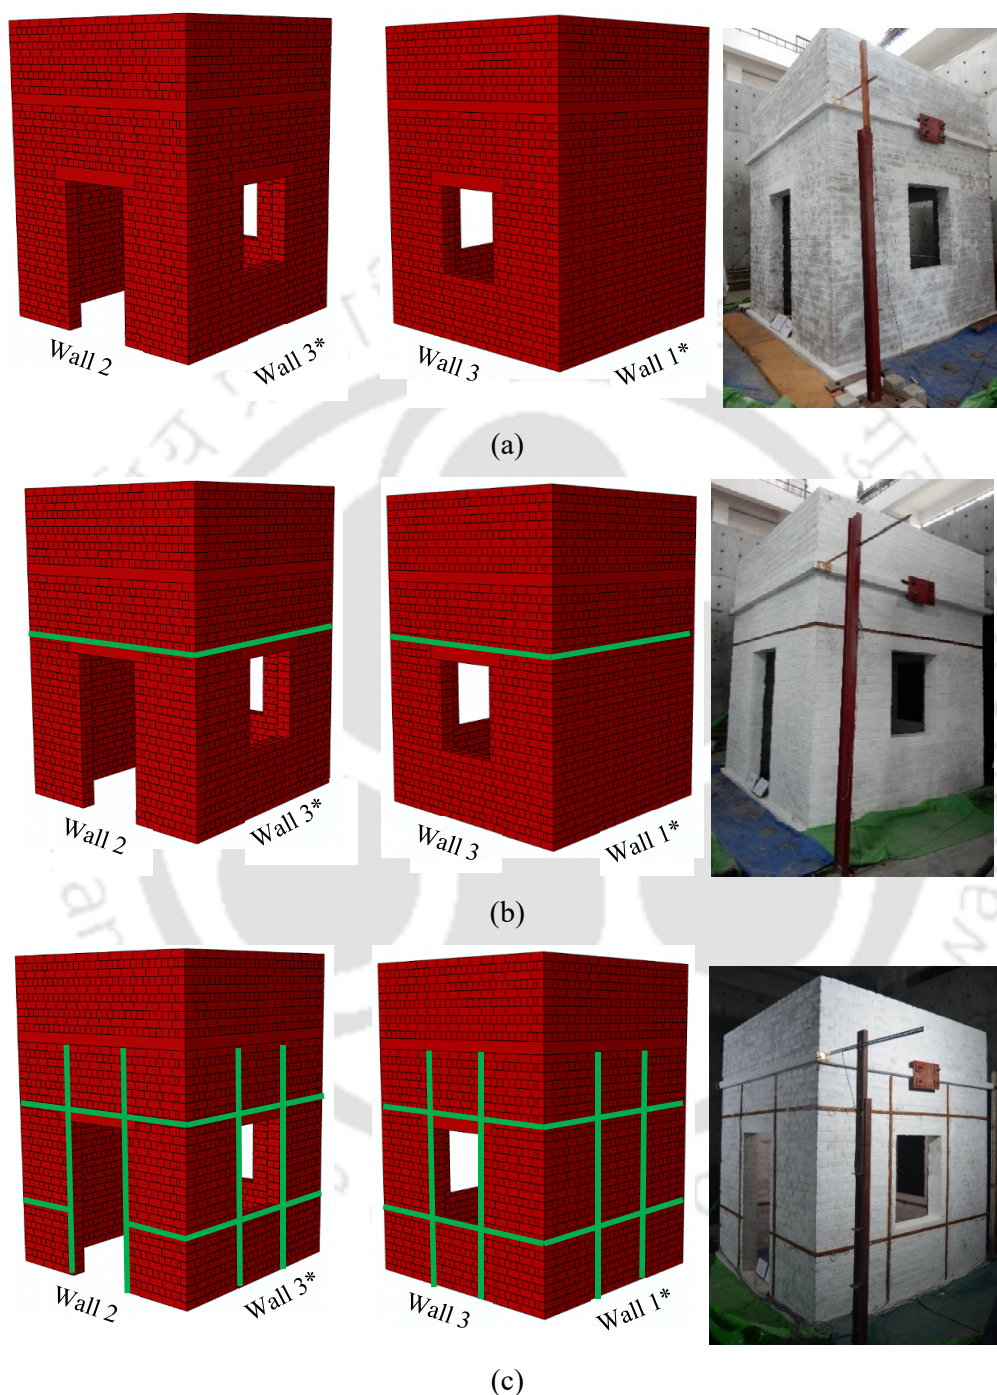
Overview of the URM building specimens: (a) unstrengthened URM Building (denoted as URM), (b) building strengthened using horizontal steel bands at lintel level (denoted as Model 1), and (c) building strengthened using horizontal steel bands at sill and lintel levels and vertical bands adjacent to openings (denoted as Model 2).
